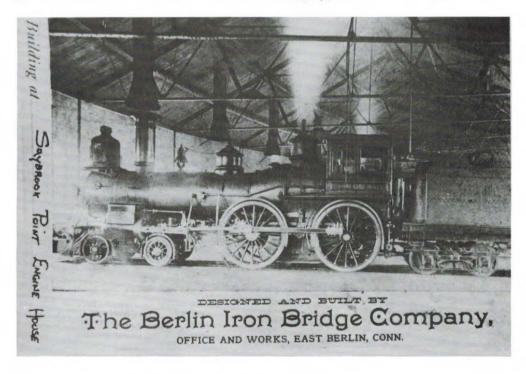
A view of the interior of the railroad roundhouse at Saybrook Point ca. 1920 showing the details of the interior roof, wall construction, and venting pipes. (Photograph courtesy Berlin Iron Bridge Company, East Berlin, CT.)
